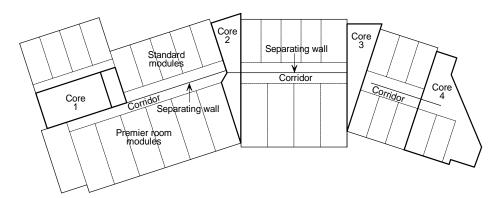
Plan of modular building at Bond Street, Bristol showing the core positions
